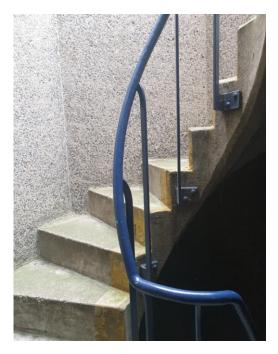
Helical stairs extending from the firefighting stairs to Roof level
